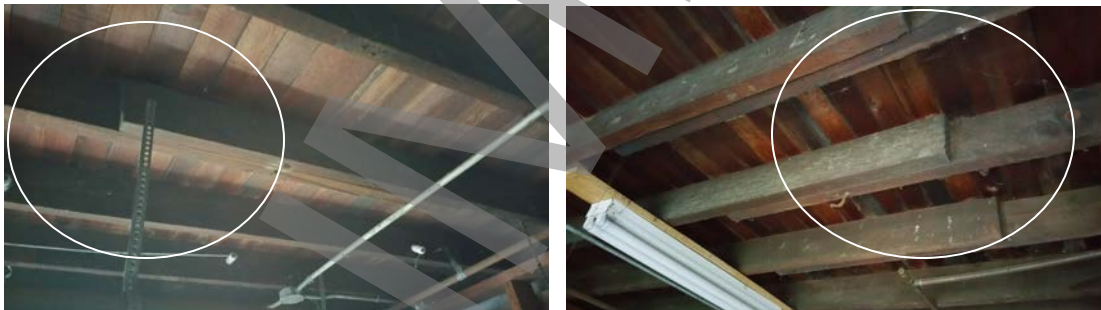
Undersized joists, and spliced at mid-span, typical!
